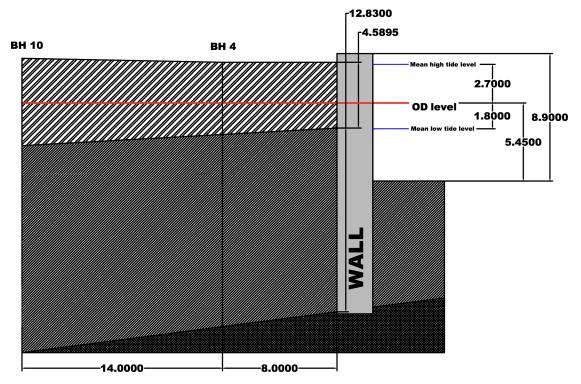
Section view of the Conceptual ground model showing strata for the active and passive sides of the wall using records and locations for boreholes 10 and 4 projected to the west end of wall site [lengths in metres]
